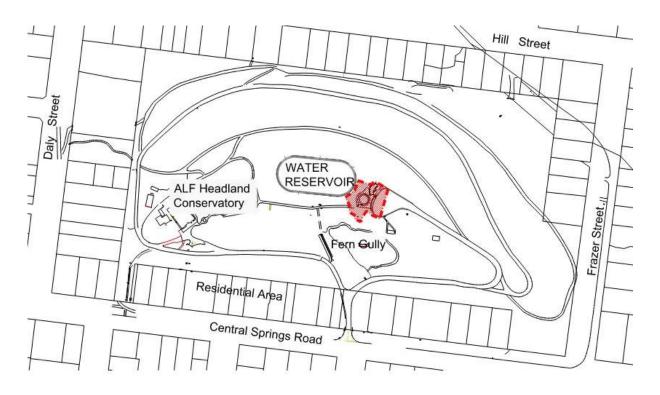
Site plan of Daylesford Botanic Gardens, excerpt of drawing number L0. The area of works is shaded red. (Source: GbLA, 2023)
